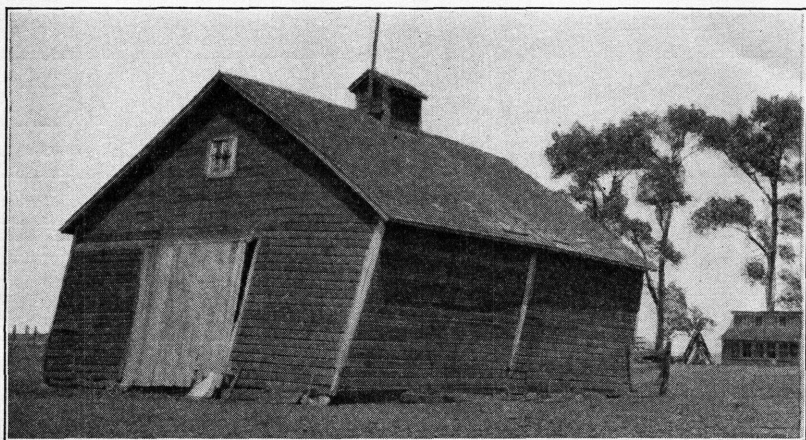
Bracing cribs when they are built avoids the conditions shown. Undermining of shallow foundation by rats hastened this failure
